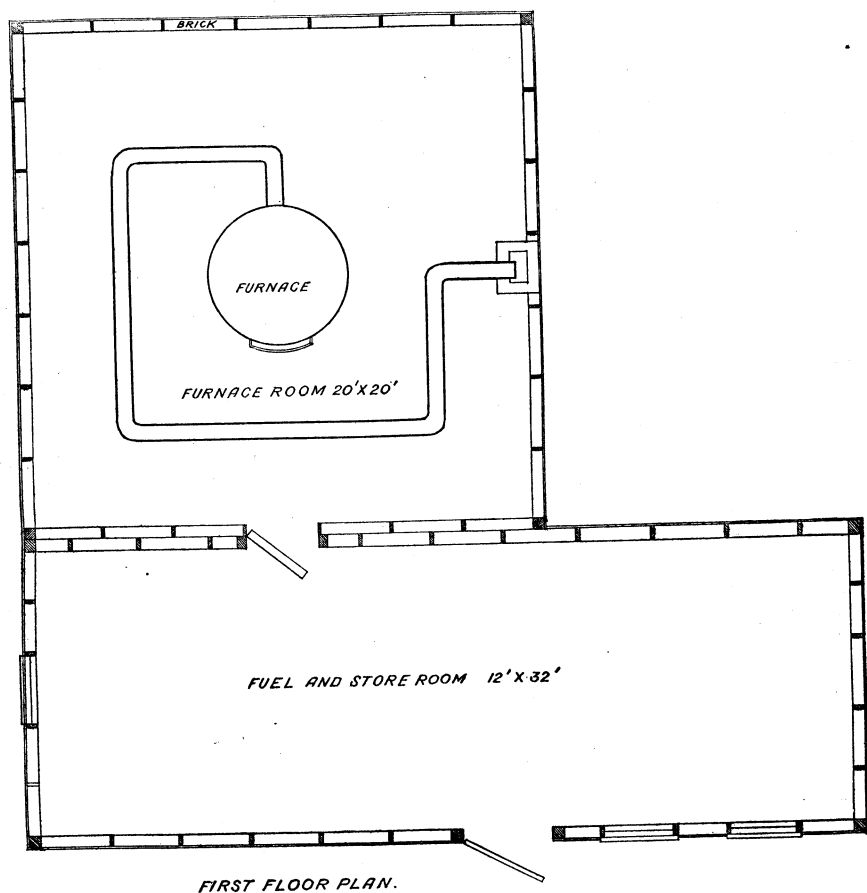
First floor plan of hop-kiln type of evaporator.
